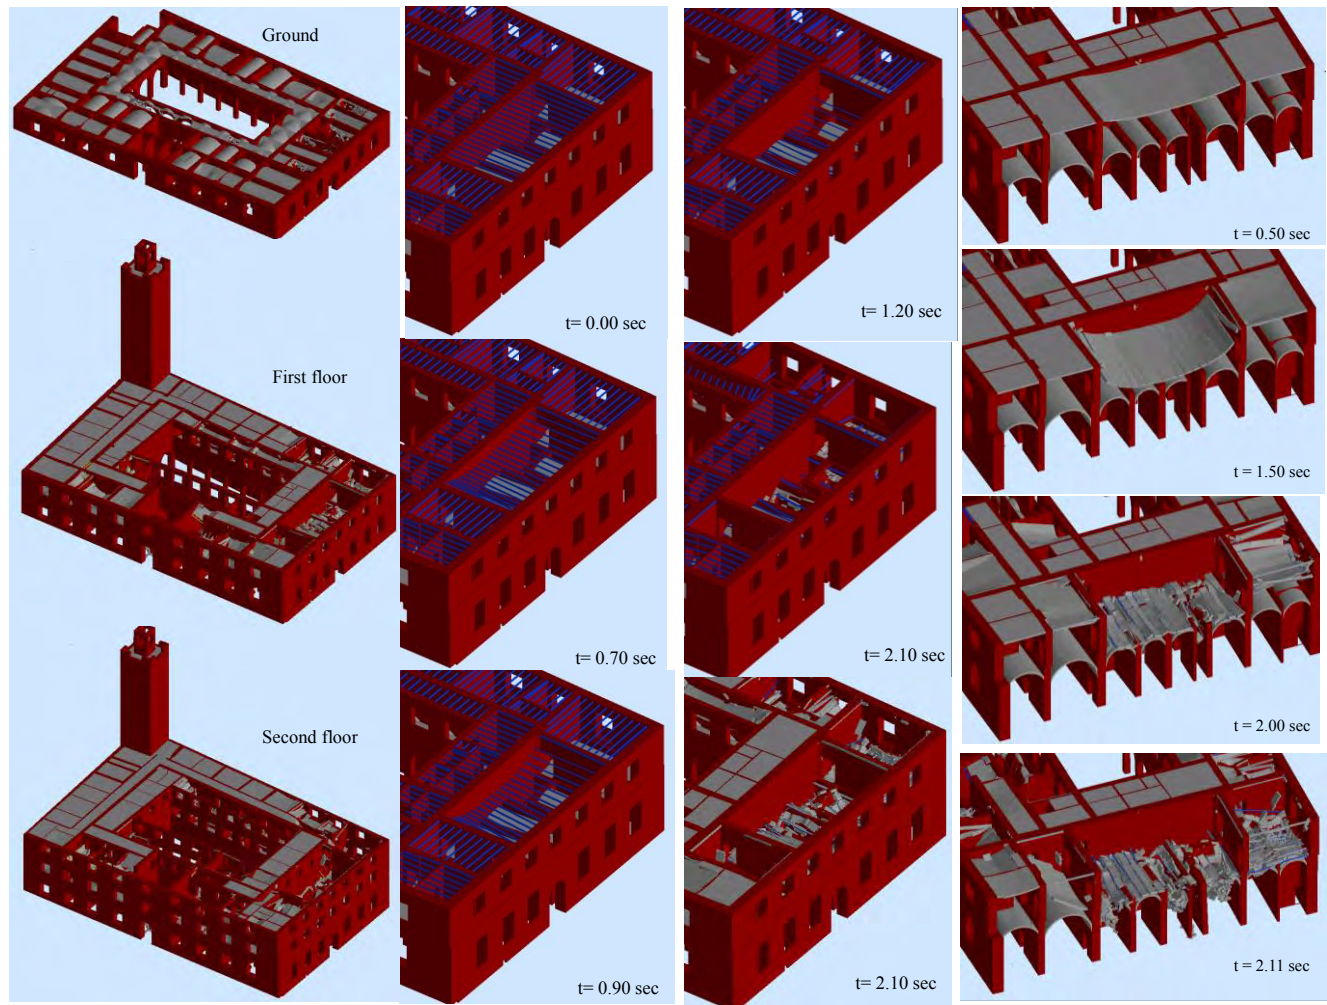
Damage of the palace obtained from AEM analysis. On the left: damage of different floors; In the middle: progression of failure through slippage of steel beams out of the walls; on the right: damage of the roof of the ground floor due to falling of the upper roofs.
